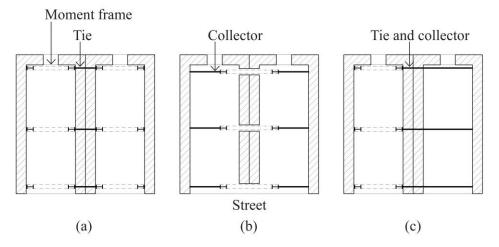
Plans of two adjacent idealized URM buildings showing moment frame retrofit structure in the transverse direction. In (a) and (b) the retrofit structure is evenly distributed in both buildings, and in (b) the frame beams tie the two buildings together. In (c) the primary retrofit structure is located in just one building. Diaphragm and wall face-loading upgrade structure is not shown.
